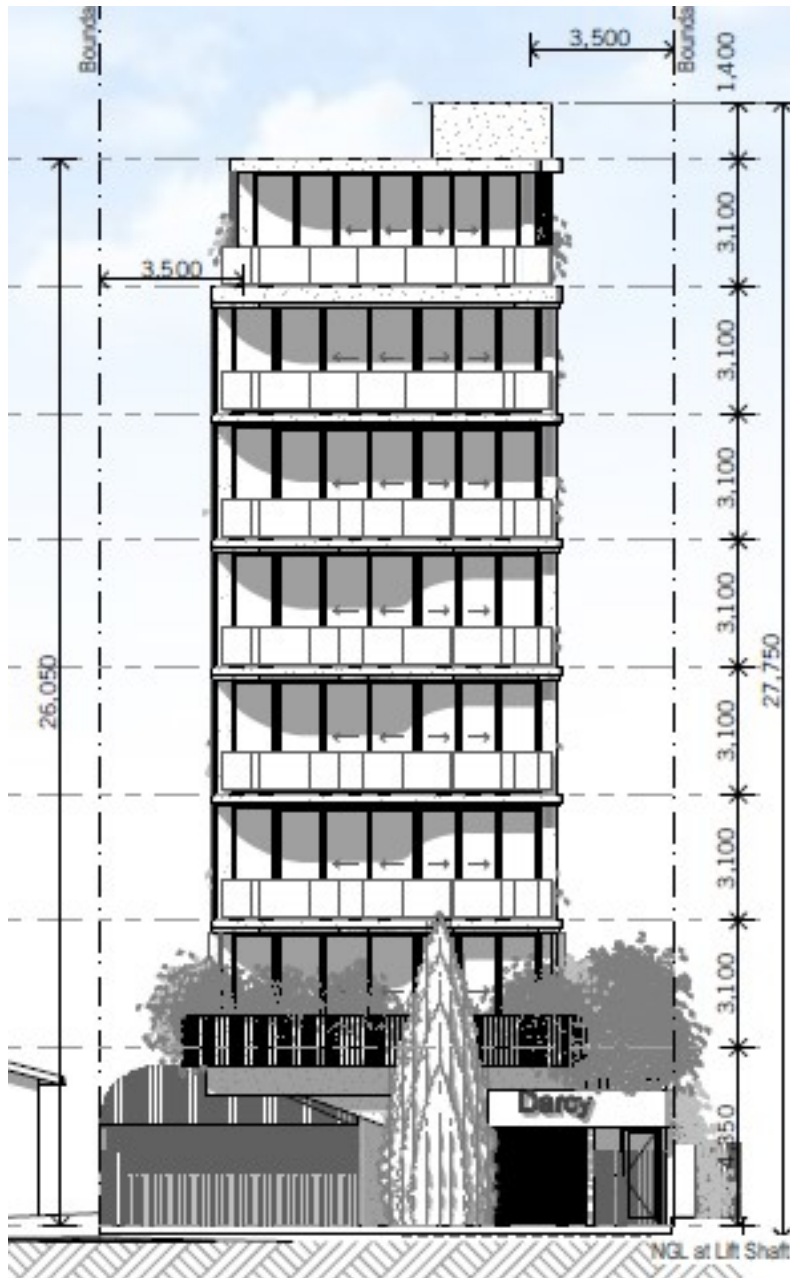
Front (west) elevation (Source: Lightwave Architecture)
